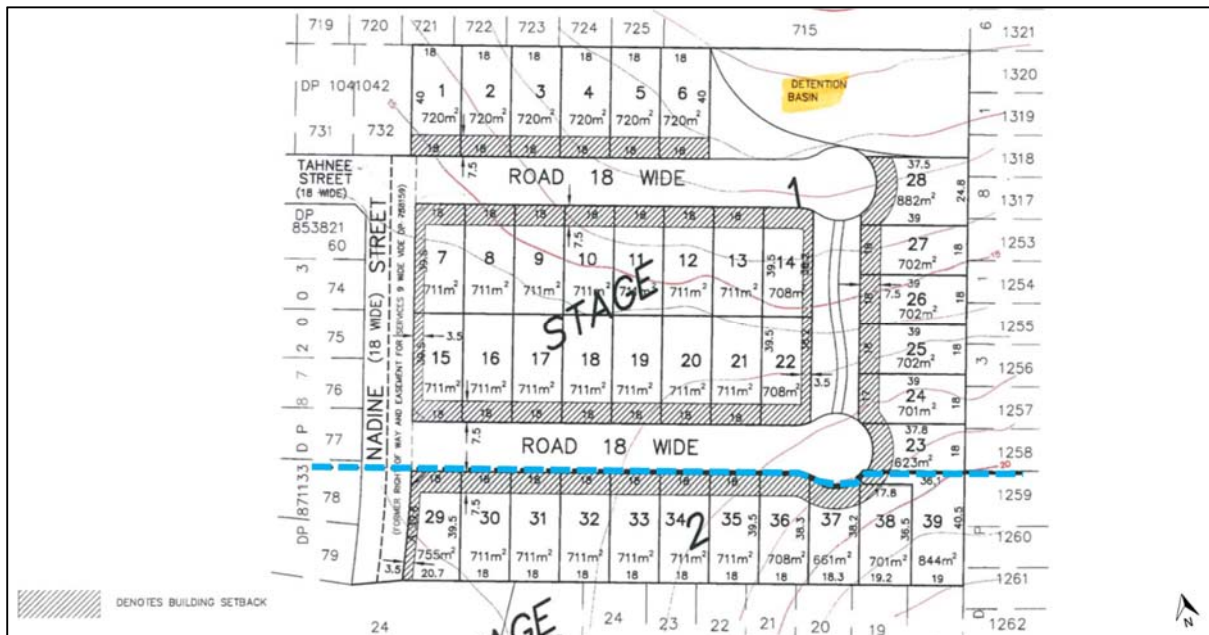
Approved residential lot layout and subdivision staging (blue line)
